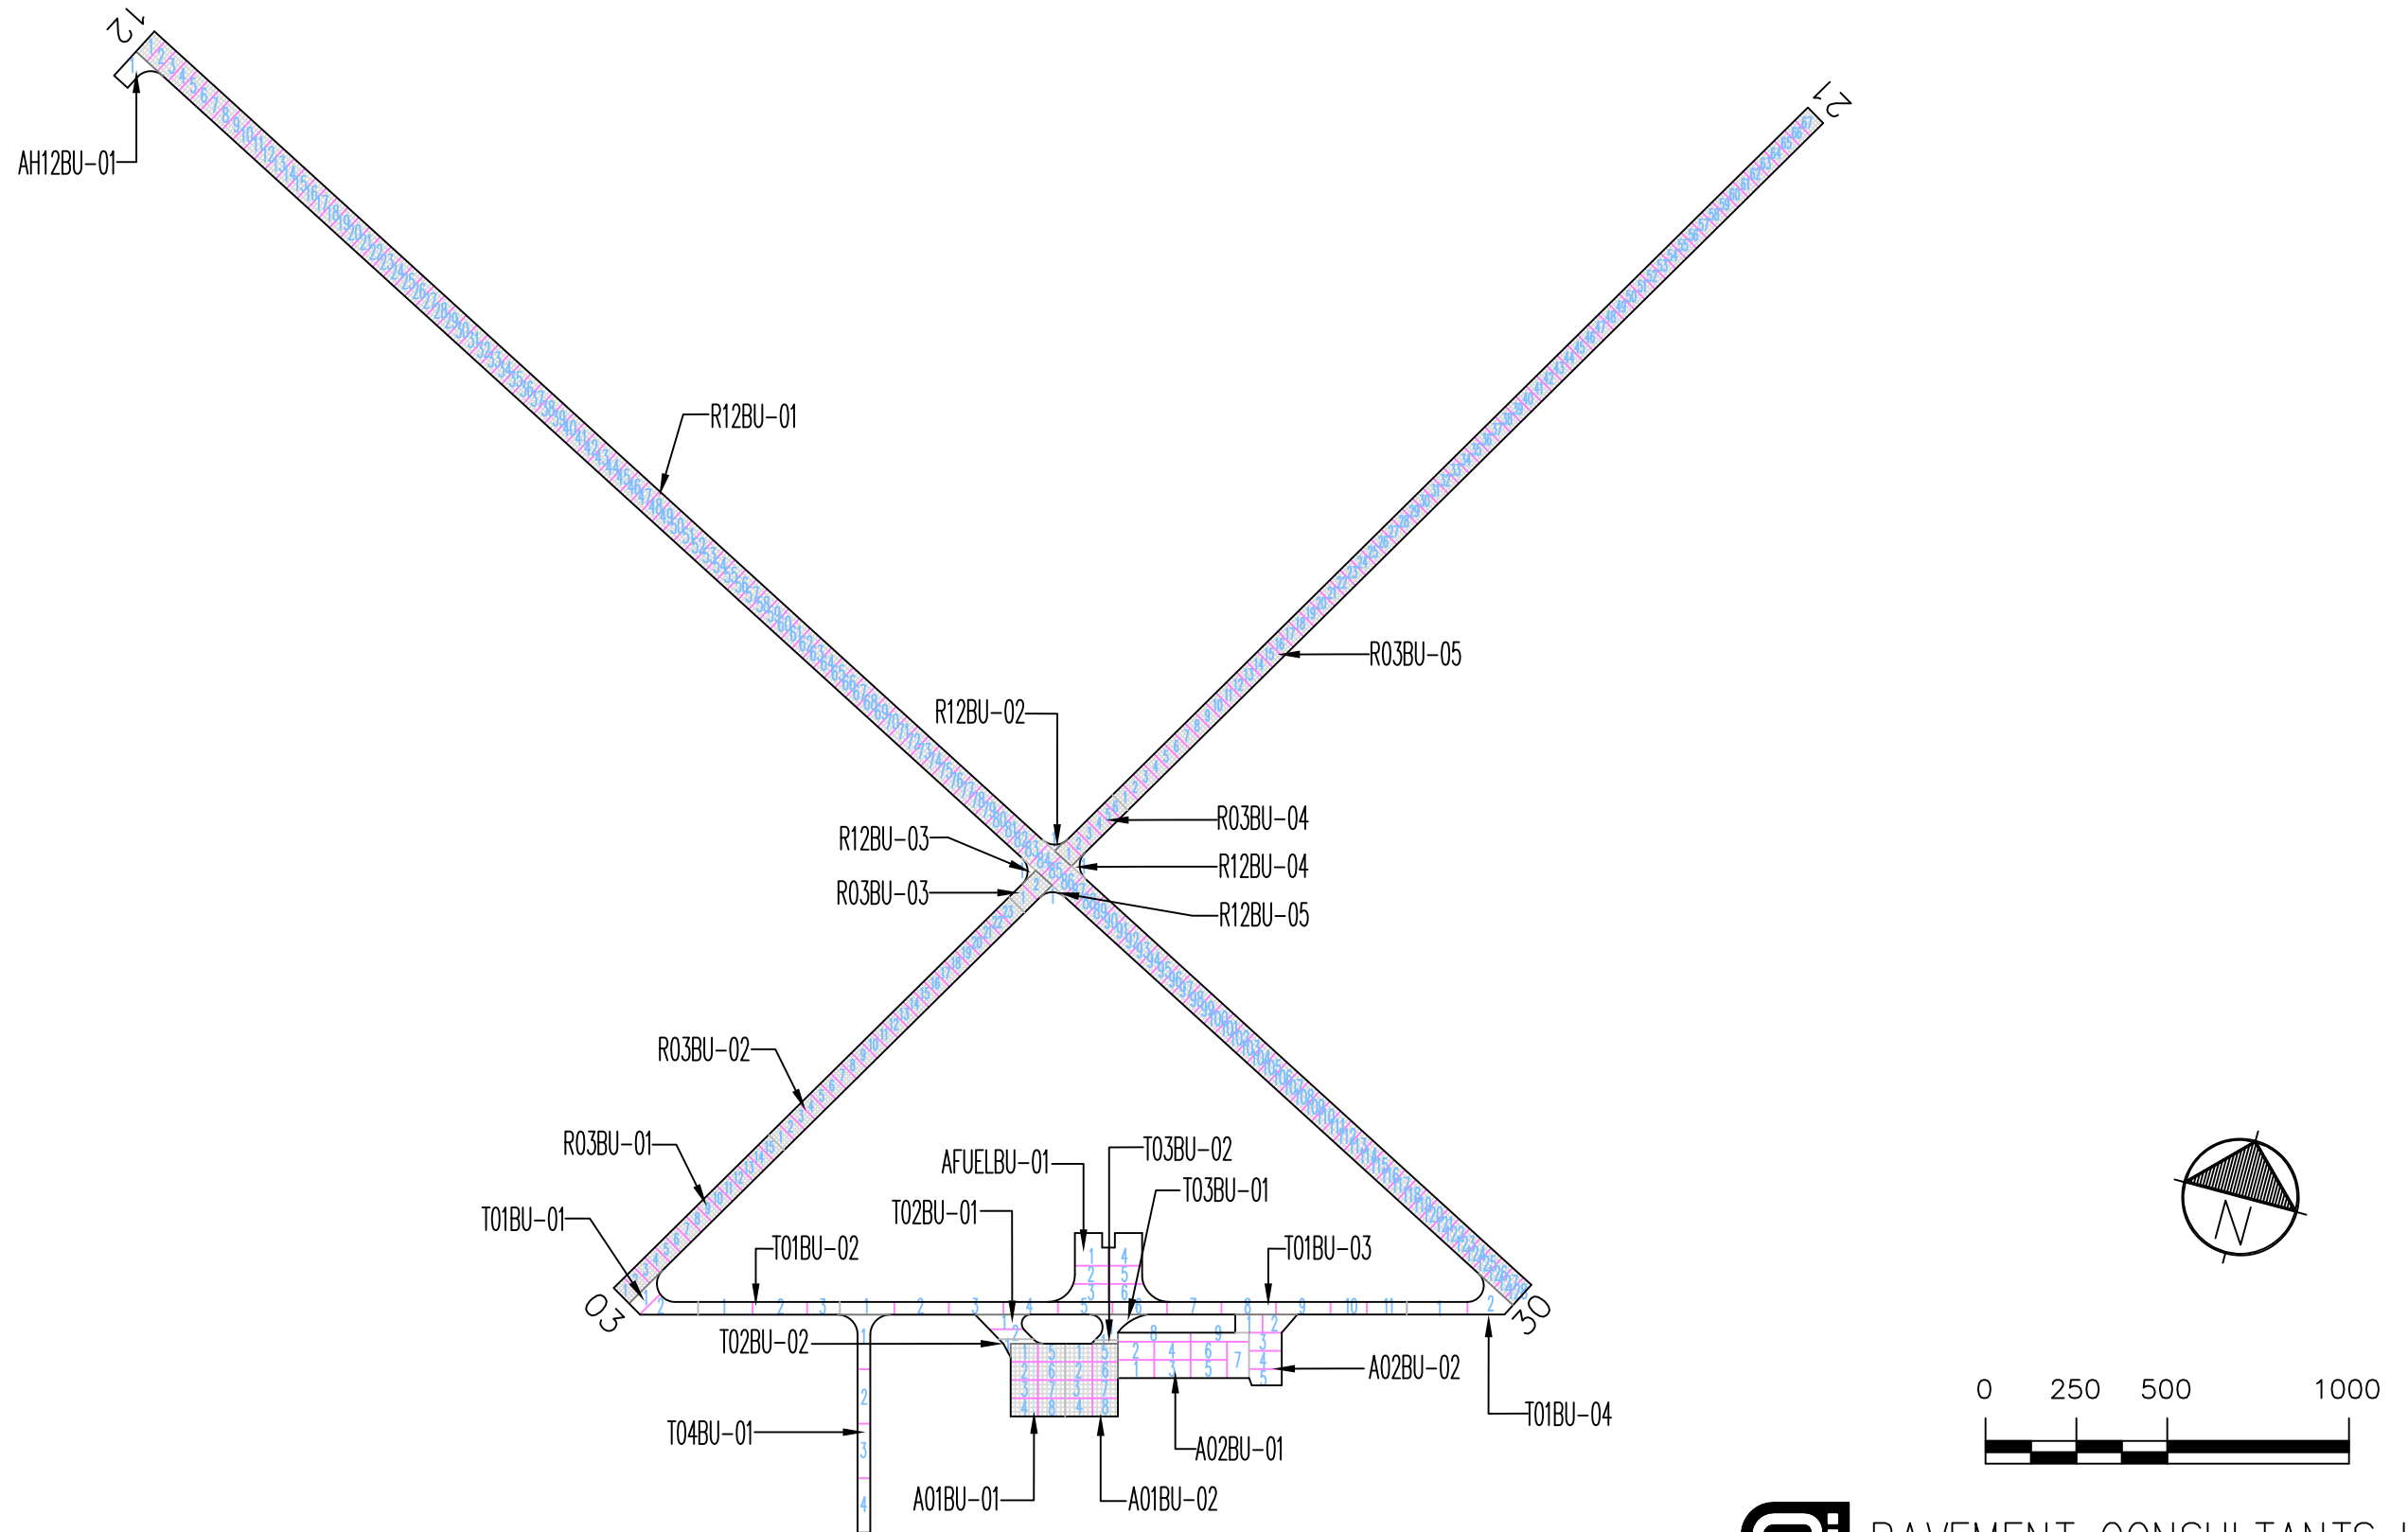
Pavement Branch, Section and Sample Unit Layout.
